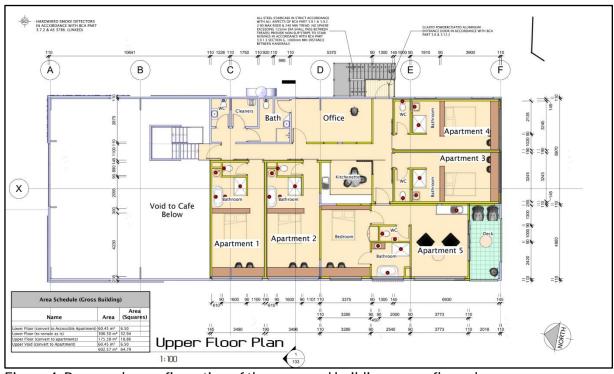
Proposed reconfiguration of the proposed building, upper floor plan.
